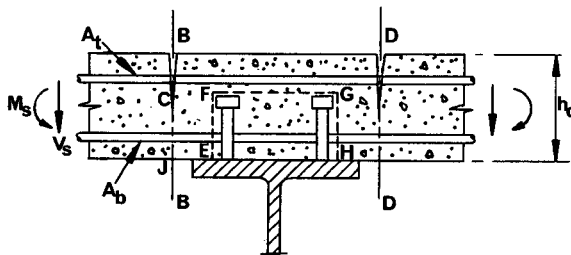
Surfaces of potential failure in longitudinal shear.
